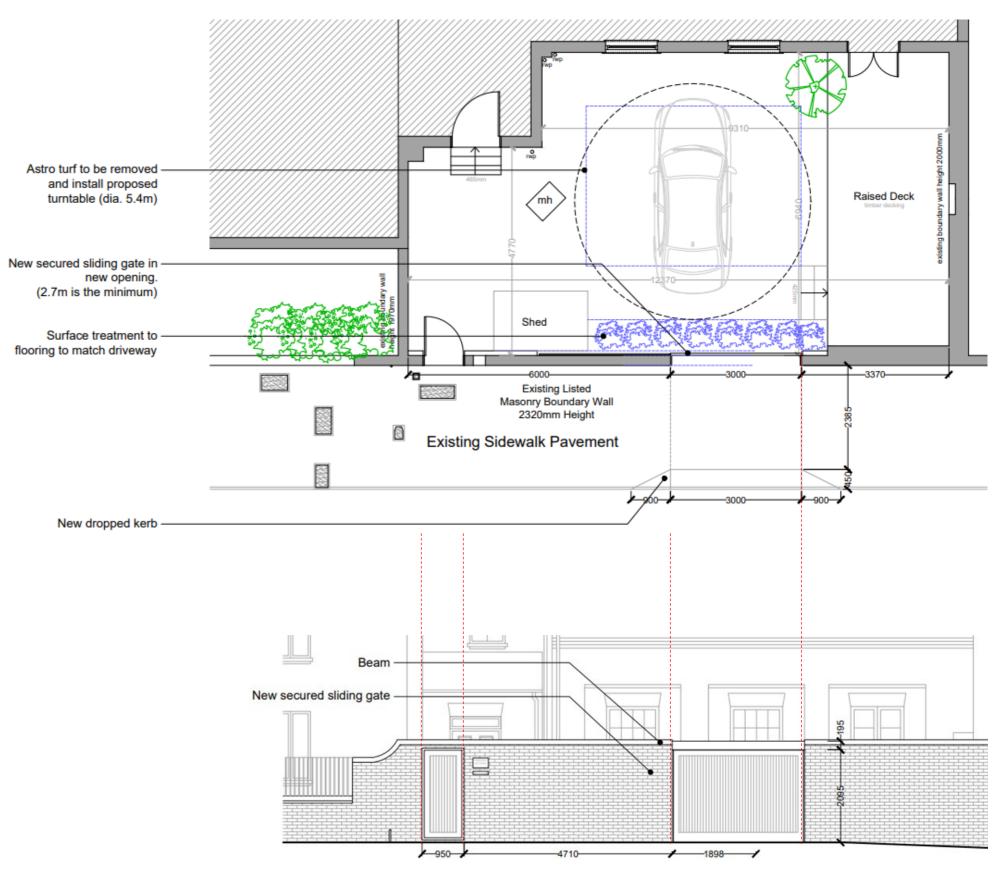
Proposed plan + street elevation illustrating an 'in-keeping' and simple gate arrangement with the parking plan above - Combining the parking with other amenity elements
